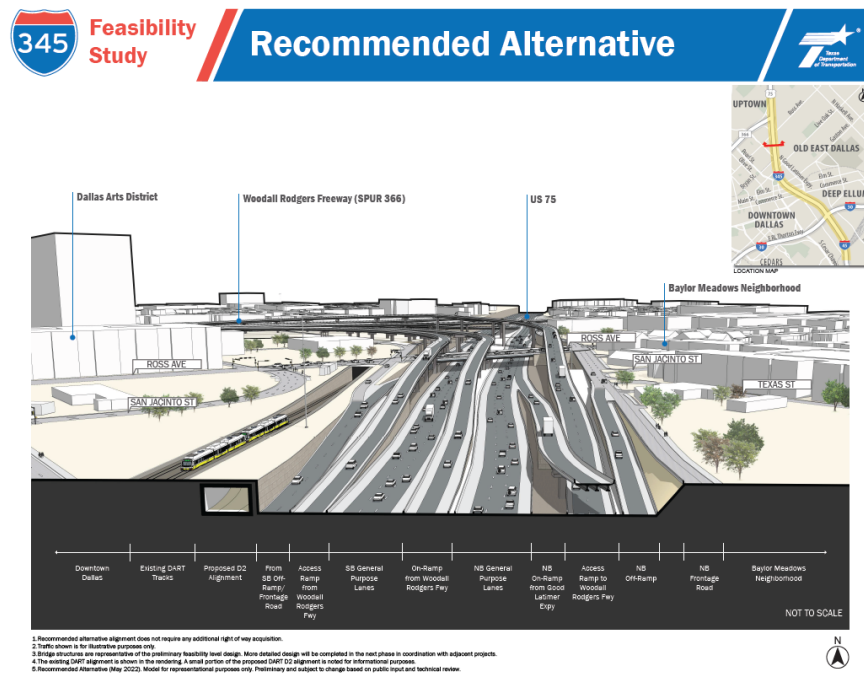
Recommended Alternative 3D Rendering Facing North Towards Woodall Rodgers (Spur 366)
